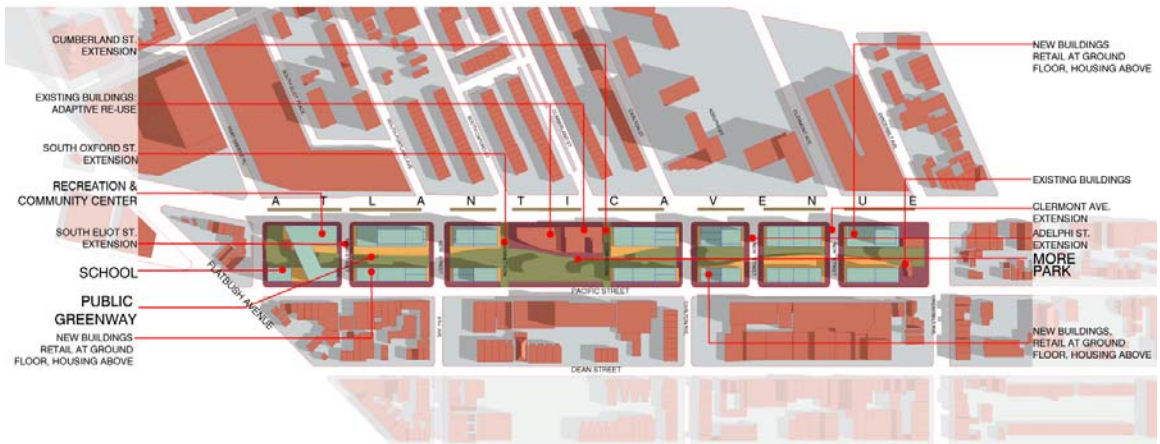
Site plan, UNITY Plan Atlantic Yards, 2005.
